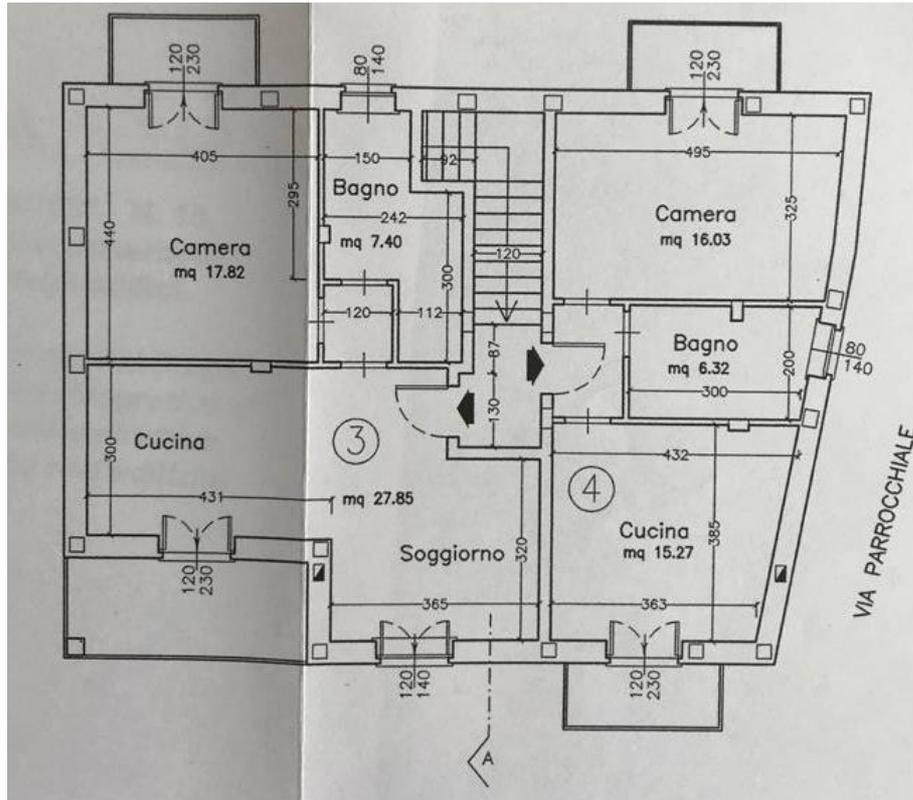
Ground Floor Plan (Via Parrocchiale 4)
